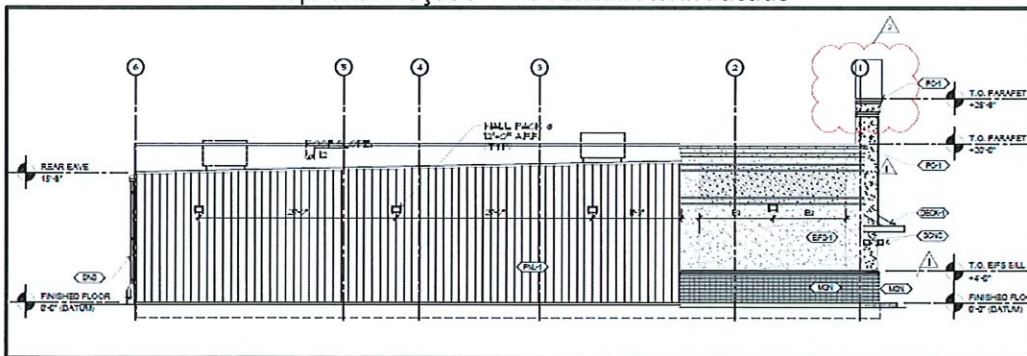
Revised Side Elevations (Source: Applicant – 1/12/23)
